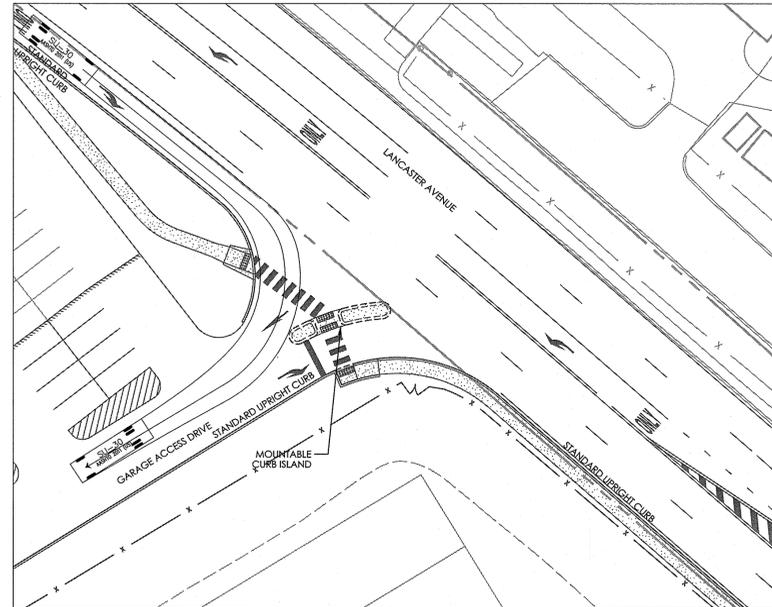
LANCASTER AVENUE TO GARAGE ACCESS DRIVE - RIGHT TURN (SU-30)
